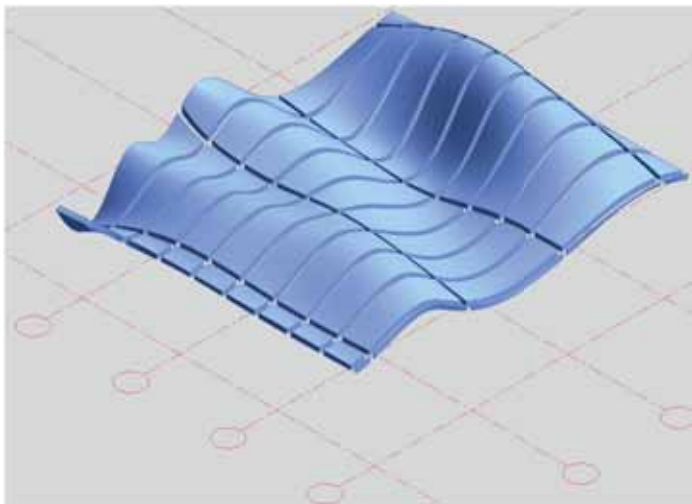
Roof Solid with All Wall joints Before Beams are Placed
